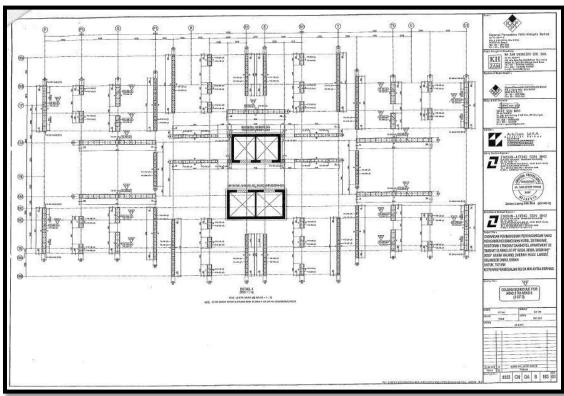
Type of small column used only to support from Level Basement to Level 4 at Hotel.
